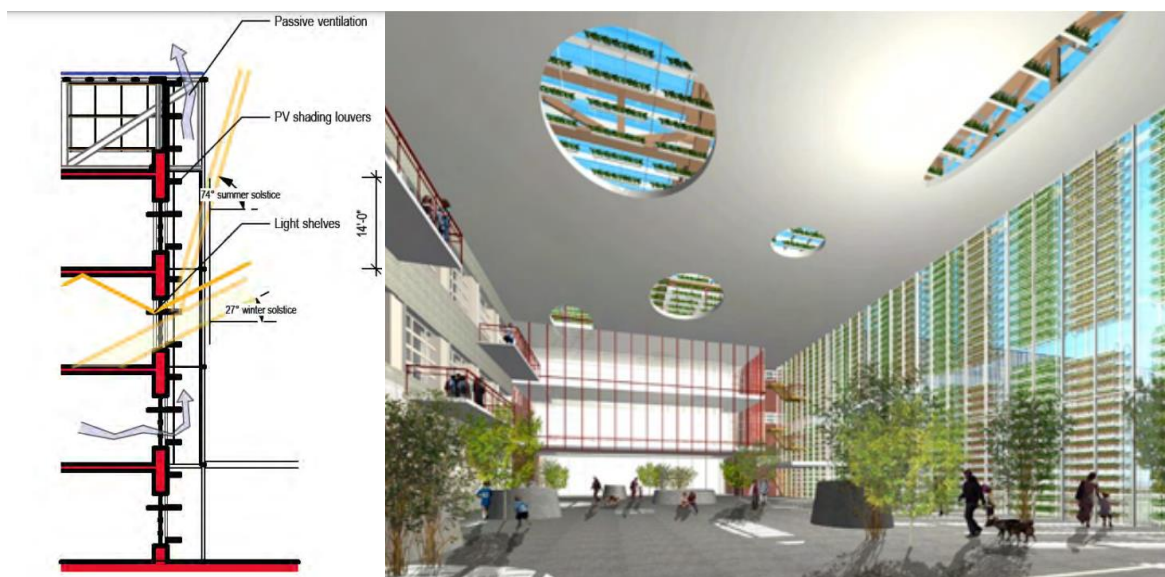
New enclosed entry with facade farm to right and openings to horizontal rooftop greenhouse above
